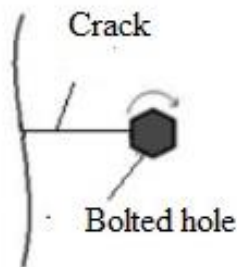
Bolted crack stop hole (Makabe et al., 2012)
